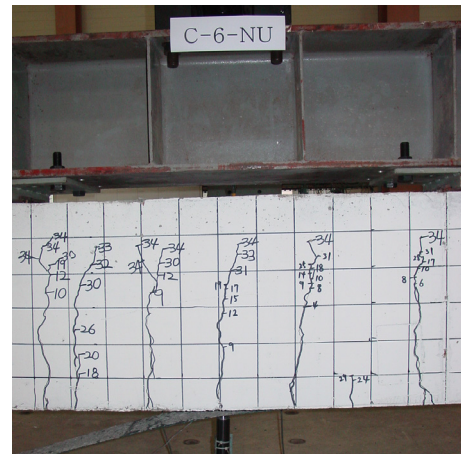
Concrete Cracks and Debonding Failure (NU Beam)
